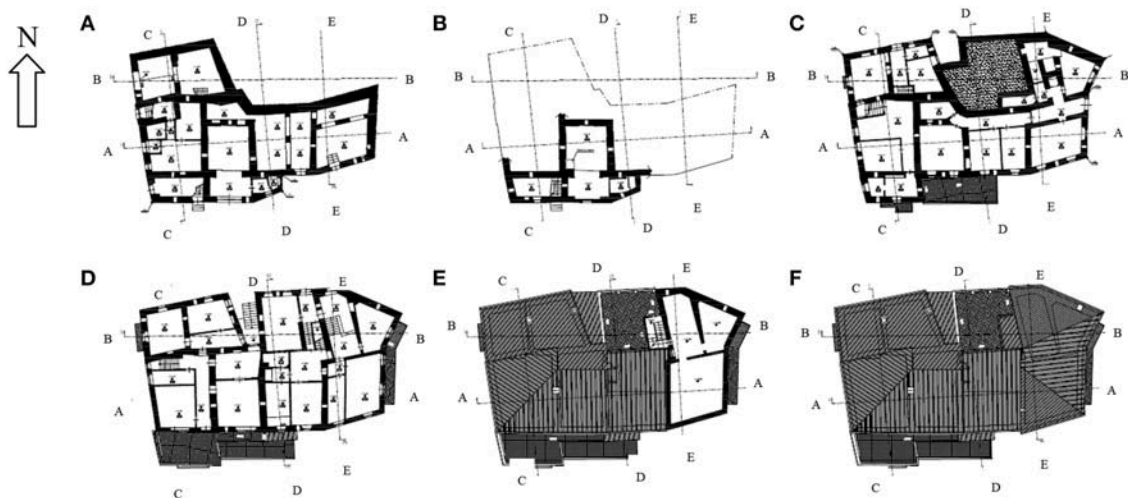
| Plan layouts of the building cluster under study: ground (A), mezzanine (B), first (C), second (D), attic (E), and roof floors (F).
